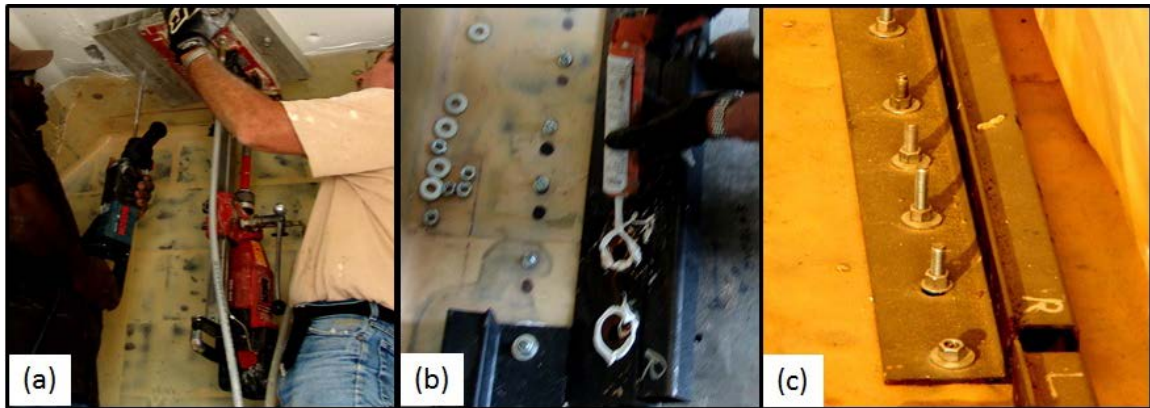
Anchor System 5. (a) Hammer and concrete core drill used to drill holes for anchor bolt sleeves. (b) Adhesive applied to bottom of angle. (c) Finished System 5 installed on the bottom support.
